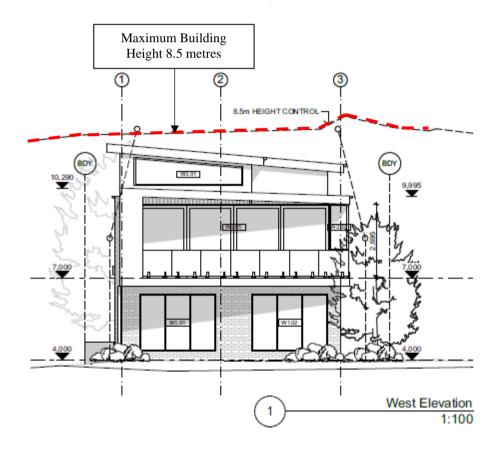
Extract from Architectural Plans showing compliance with building height envelope (Section A)
